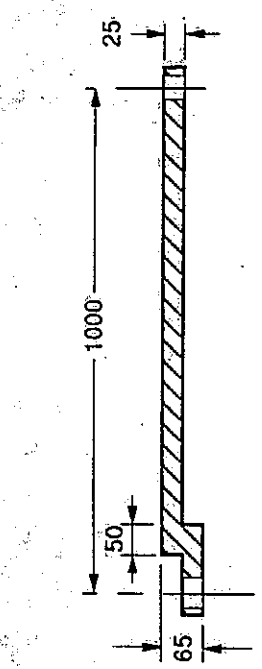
RIGID MCB WITH LOCKING CHANNEL - AUSTRALIAN DESIGN
